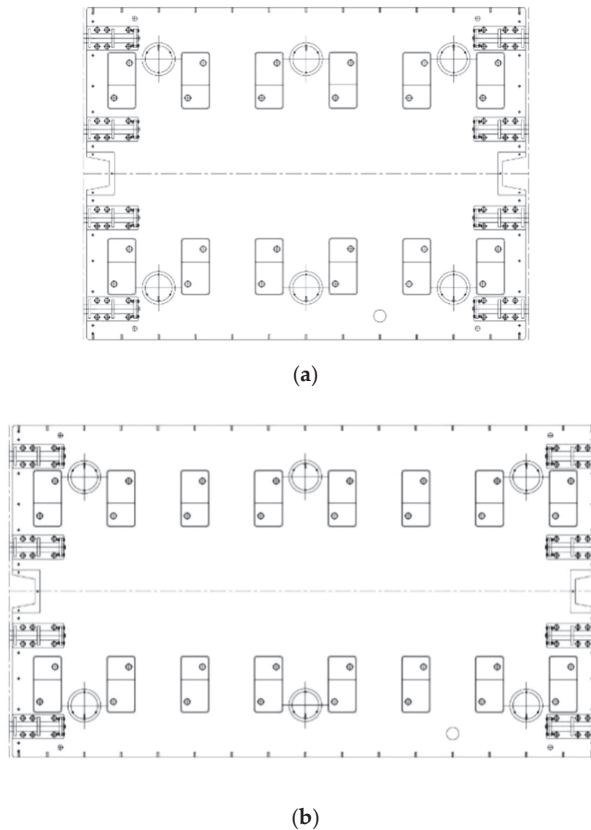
Schematic diagram of floating slab track. (a) Design drawing of 3.6 m SSFST. (b) Design drawing of 4.8 m SSFST.
